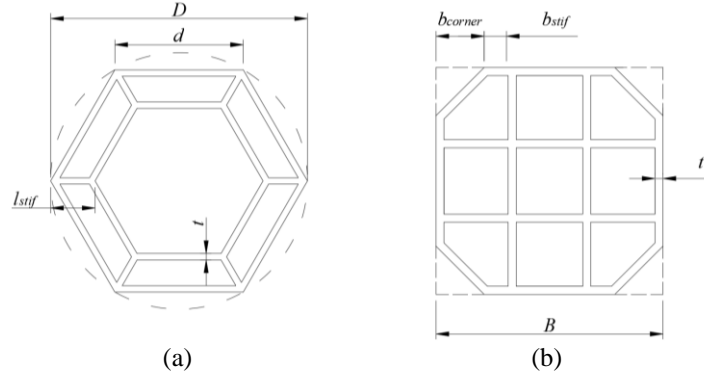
Geometry and notation for polygon stiffened sections – a. DWP section – b. ISO section
